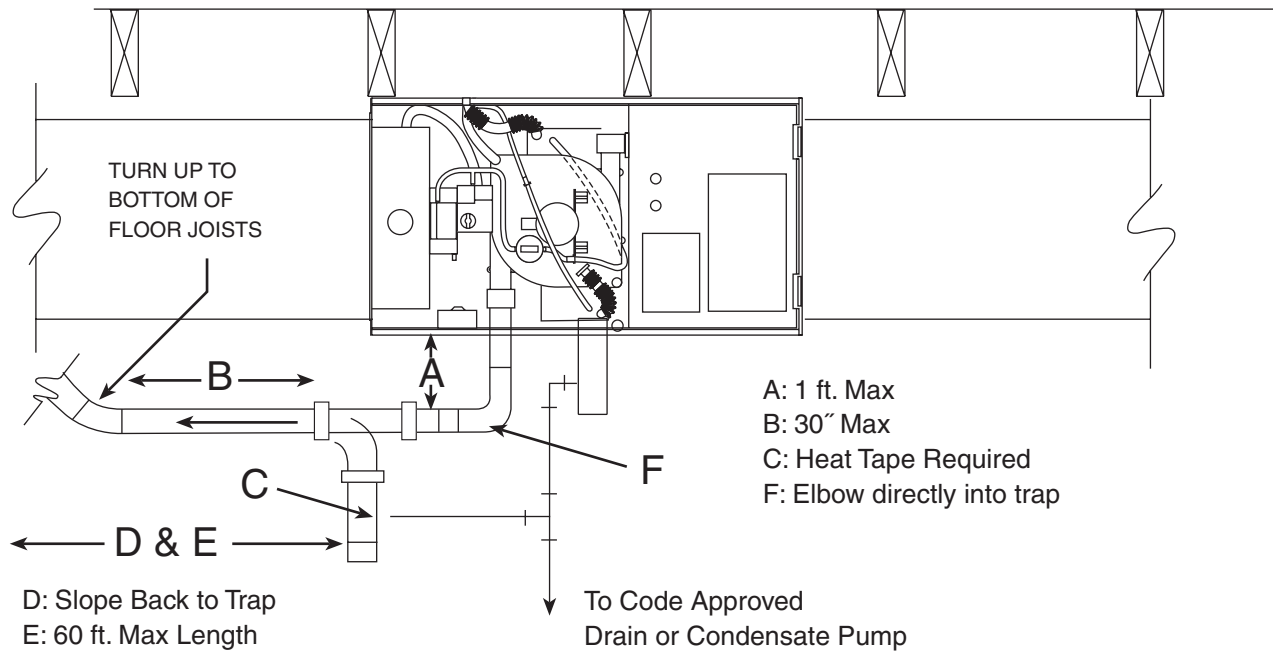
Vent Located Below Floor in Which Furnace is Located with Vent Between Floor Joists
